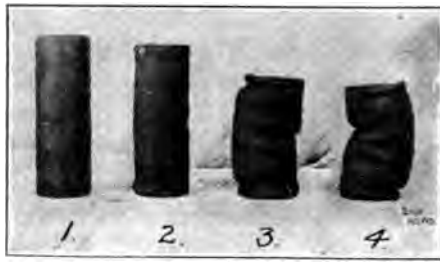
View Showing Flow of Concrete Under Heavy Pressure.
